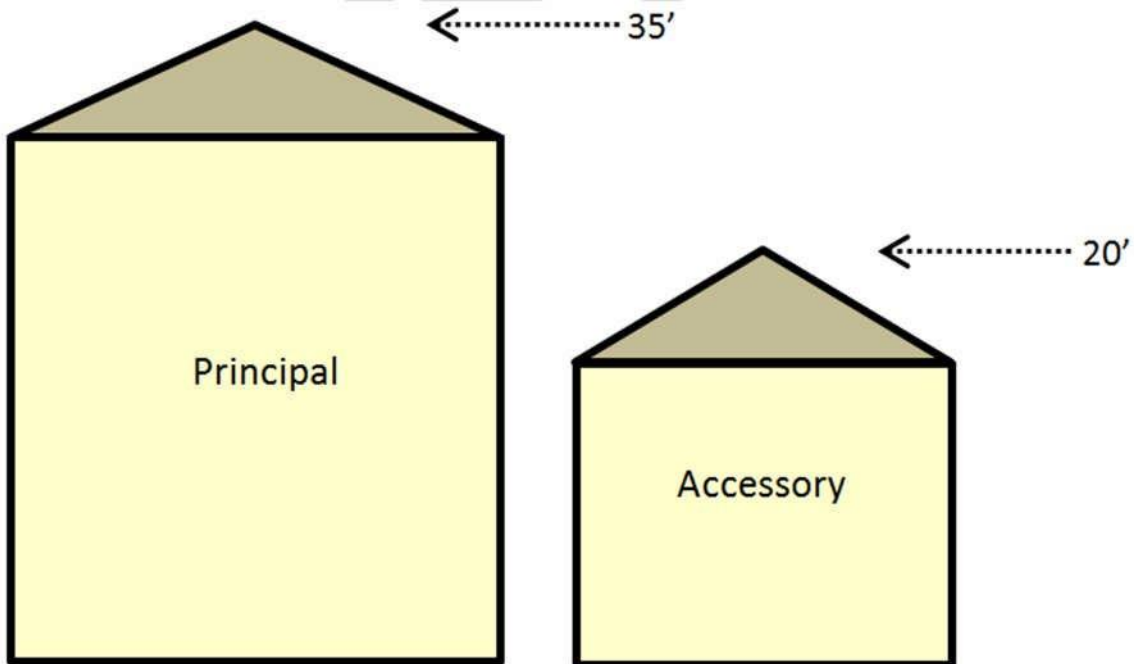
Typical MFR Zoning District Building Height Example (Abutting Lots Not Developed) (Not Drawn to Scale)
